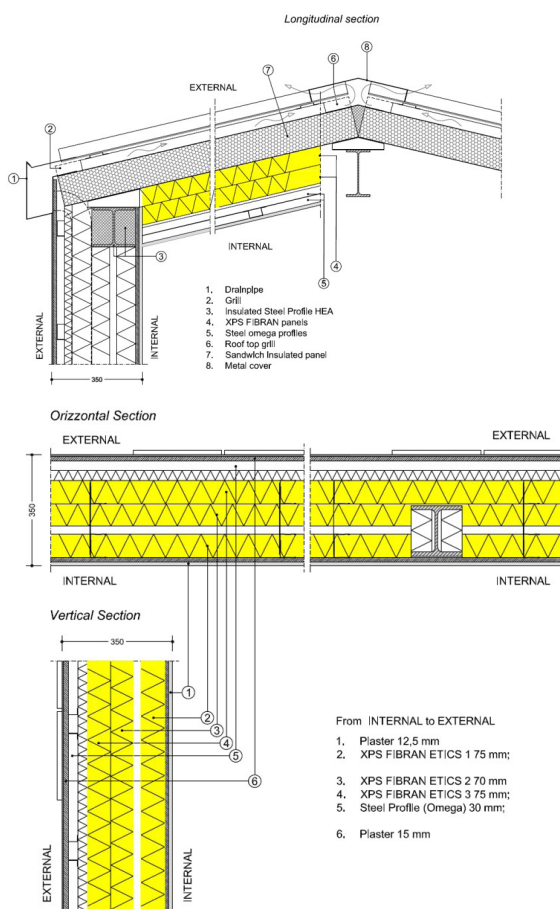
The application of the FIBRAN insulation in the roof and in the walls in the Italian case study
